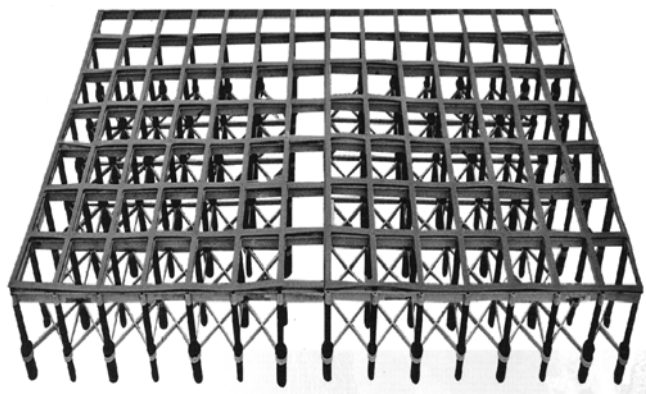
The Structure of JWS Structural Pervious Air-Circulated Aqueduct Concrete Pavement.
